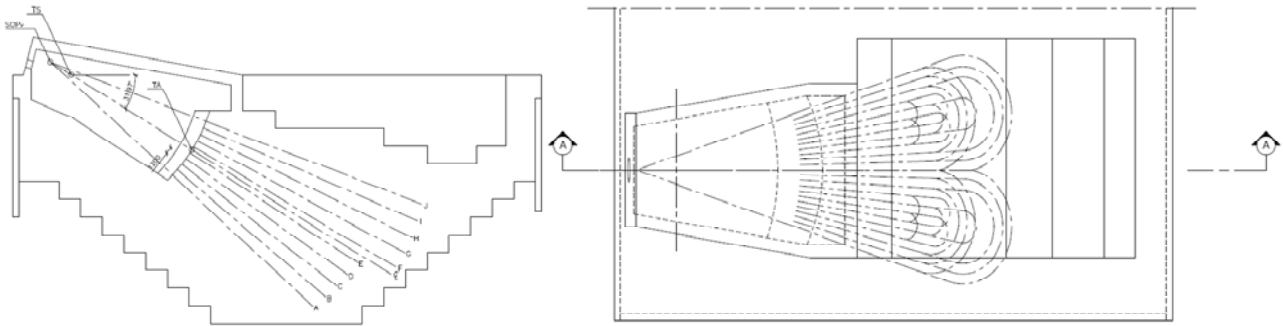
Arrangement of prestressing loops in the Calabrian anchor block.
